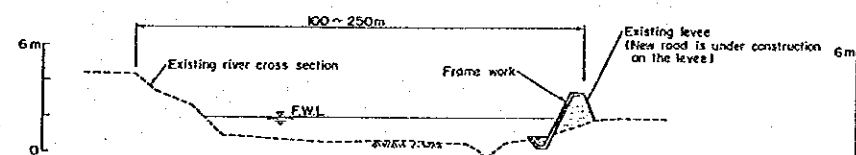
Proposed River Improvement Plan (2/8)
